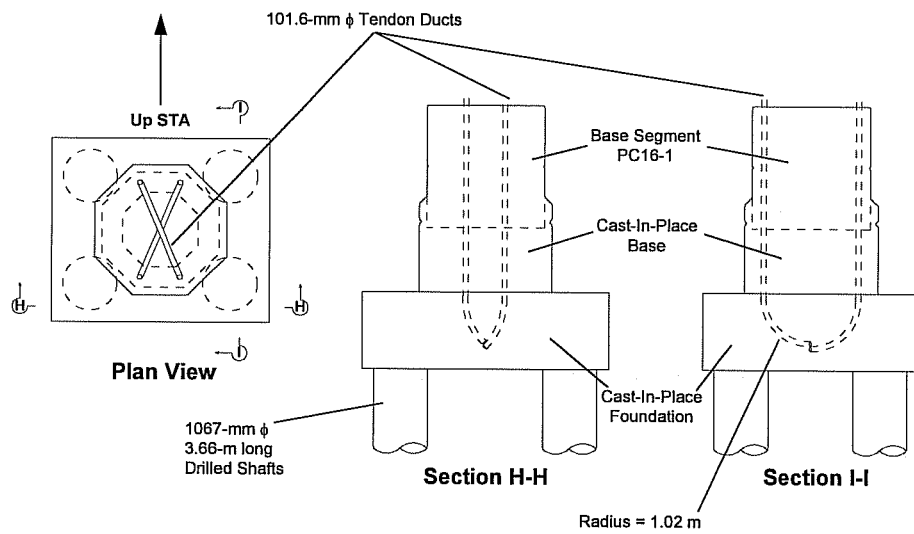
"U-turns" in tendon ducts located in pier foundation.
